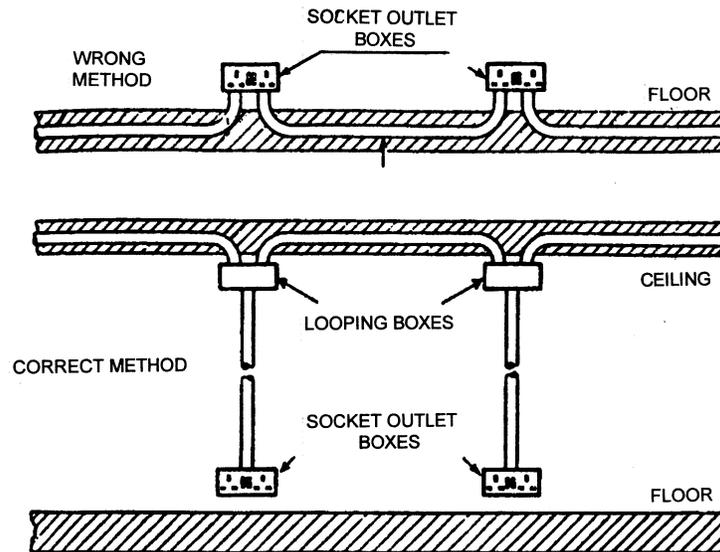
DETAILS OF CONDUIT BOX AND METHOD OF HASTENING CONDUIT
